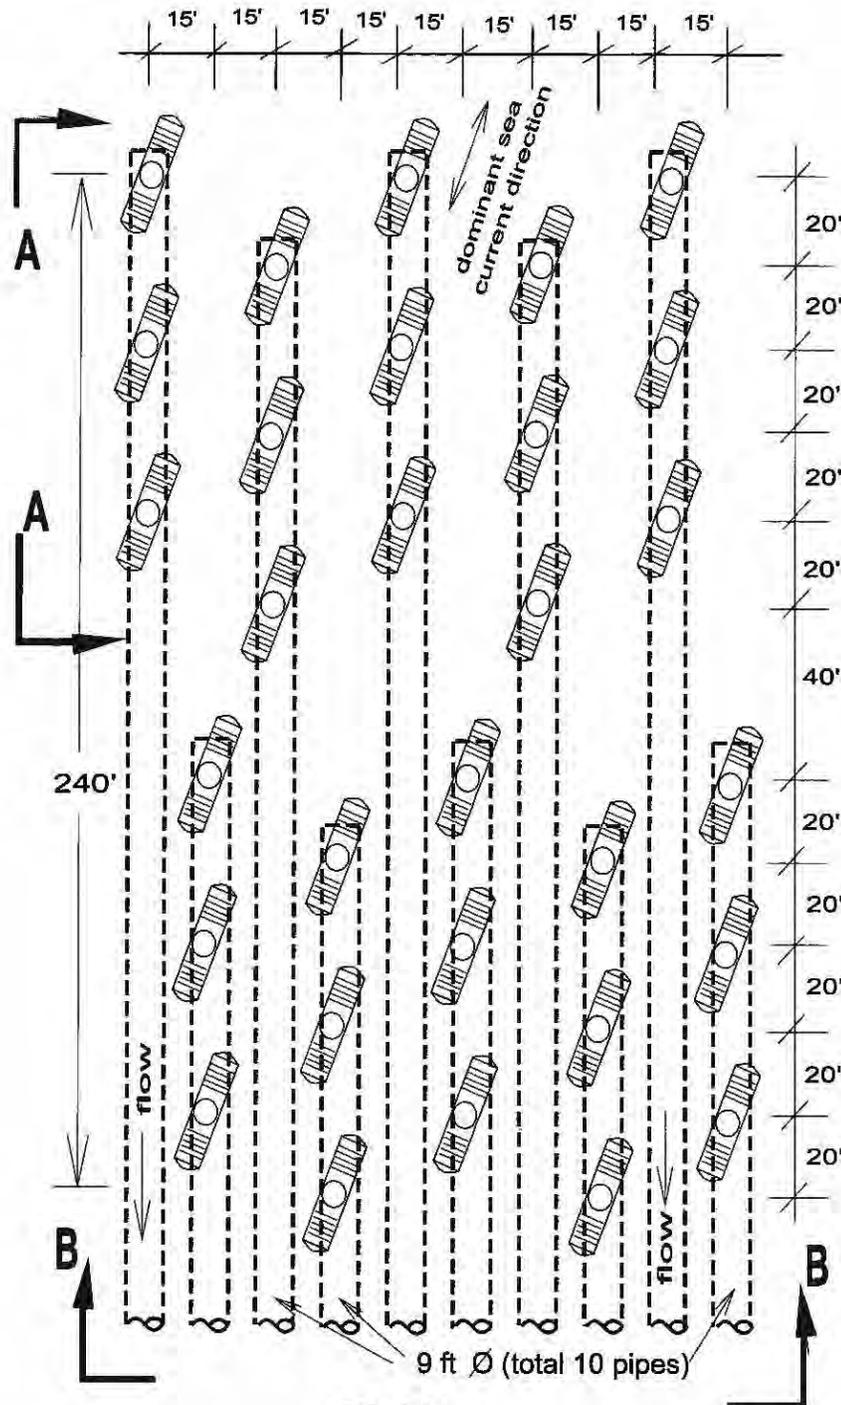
DCPB Bathymetry/Buried Pipe Layout with 6-mm-Slot Screens (Contour elevations = feet below MLLW)
